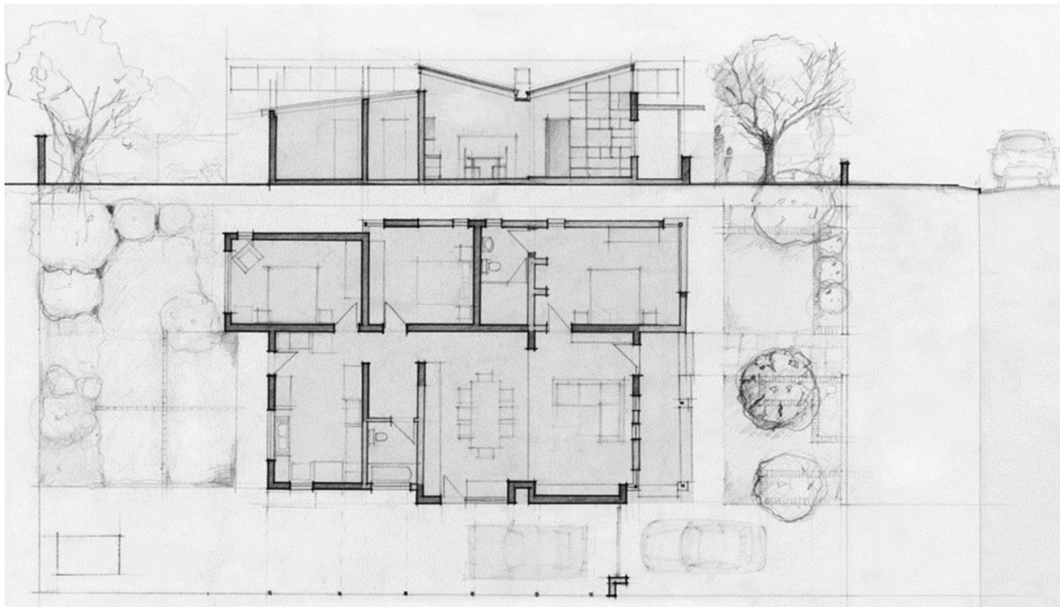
Plan and section of the renovation showing additions and existing material in darker shade (authors).
